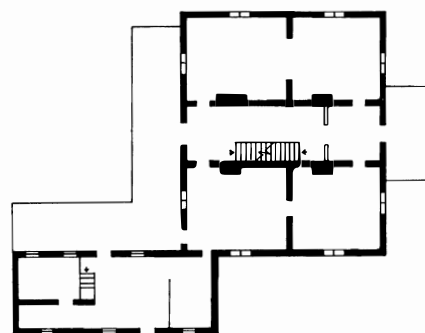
Bethel Green Plan. This double-pile Georgian plan has a two-room ell uncommon for houses with this four-room plan.
